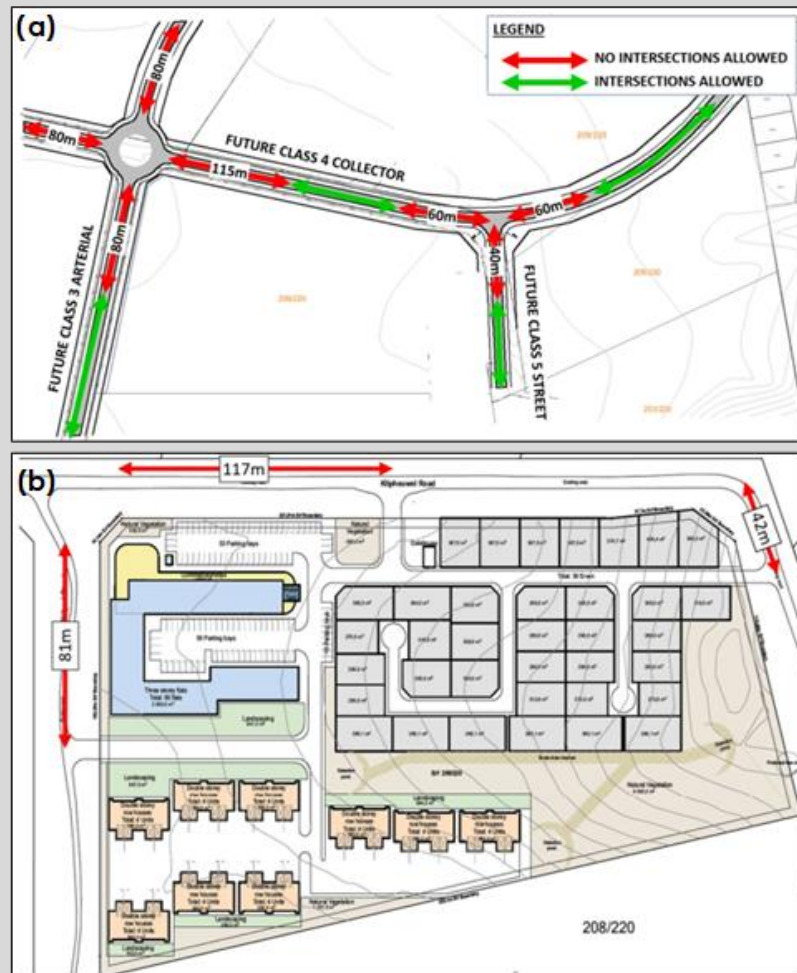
(a) Allowable Access Positions considering the Aalwyndal Road Master Plan (b) Proposed Development Access Spacing.
